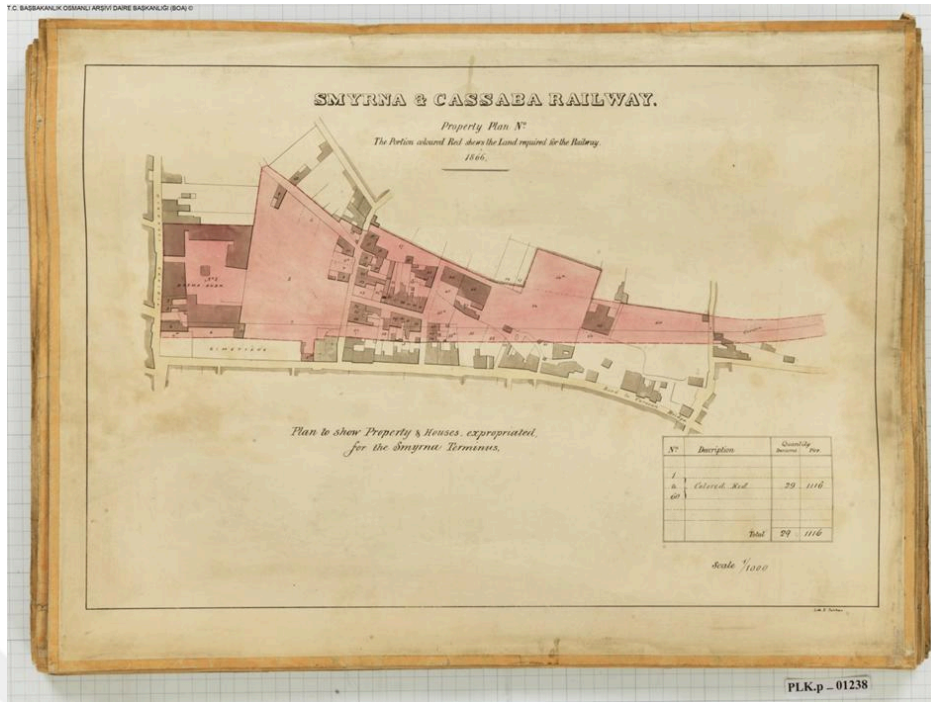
Plan of İzmir-Kasaba Railway N.0, 1866
